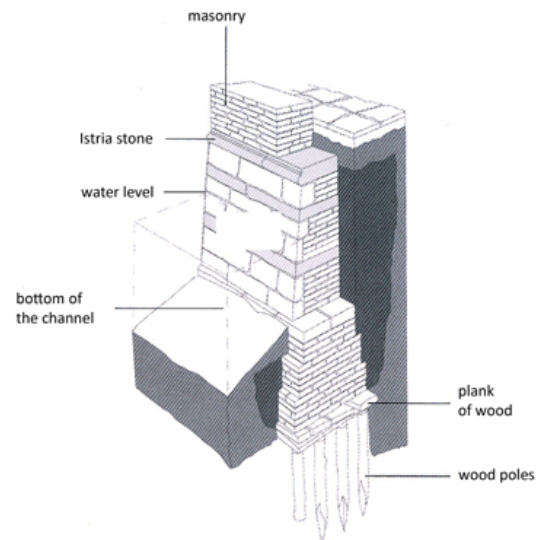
5 The foundation of the buildings in Venice. (Stefano Zanovello from a drawings of Mario Piana)
